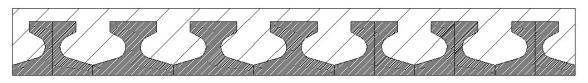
B - PRESTRESSED CONCRETE PRECAST INVERTED T-BEAMS WITH IN SITU INFILL
